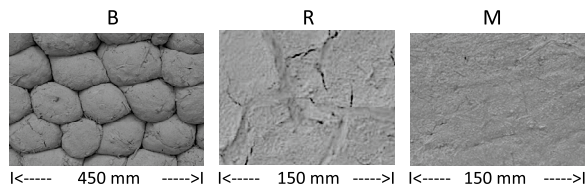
Construction styles. Left to right: B (ball surface); R (rendered surface); M (monolithic)
